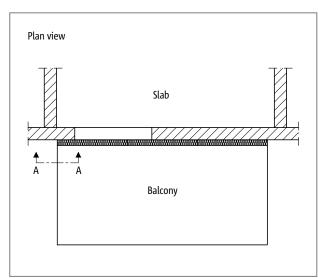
Schöck Isokorb® T type K: Diagram of the position of Section A-A
